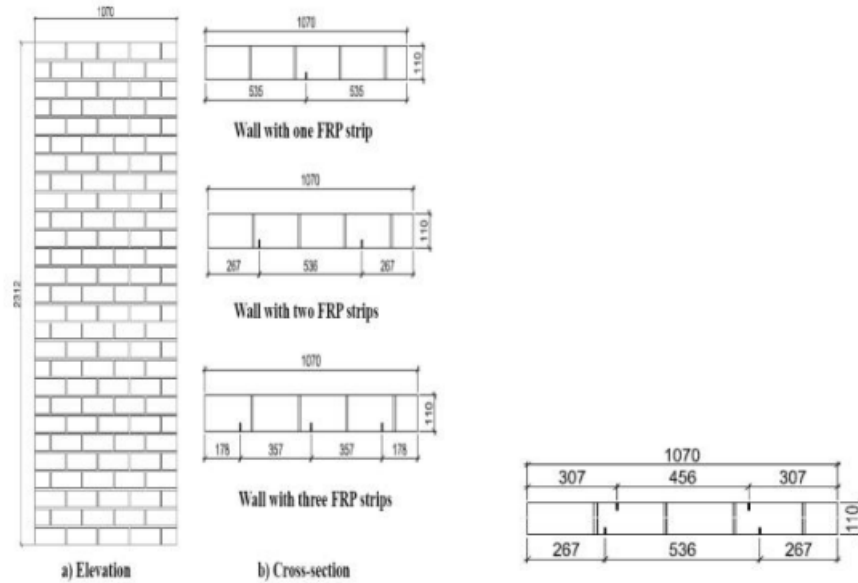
Geometric specimens' details - Walls 5-15. By: Kashyap.
